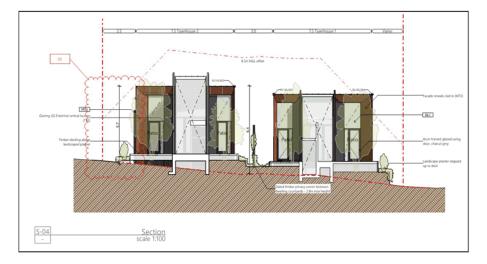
Section of proposed multiple dwellings illustrating building envelope projections.
